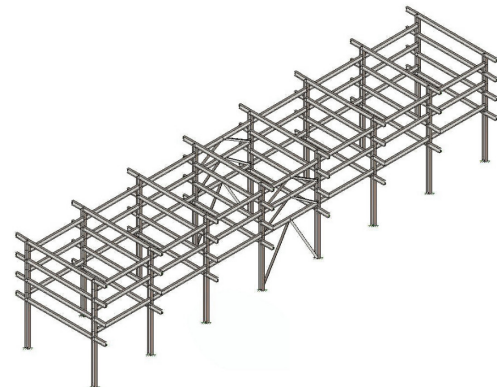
Typical four-level pipe rack consisting of eight transverse frames connected by longitudinal struts.
